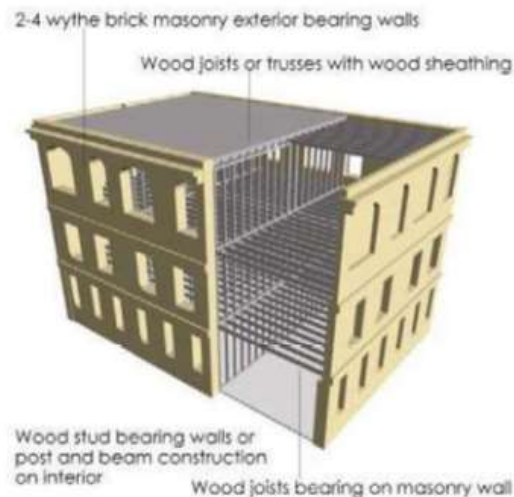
Building Type URM: Unreinforced Masonry Bearing Walls
